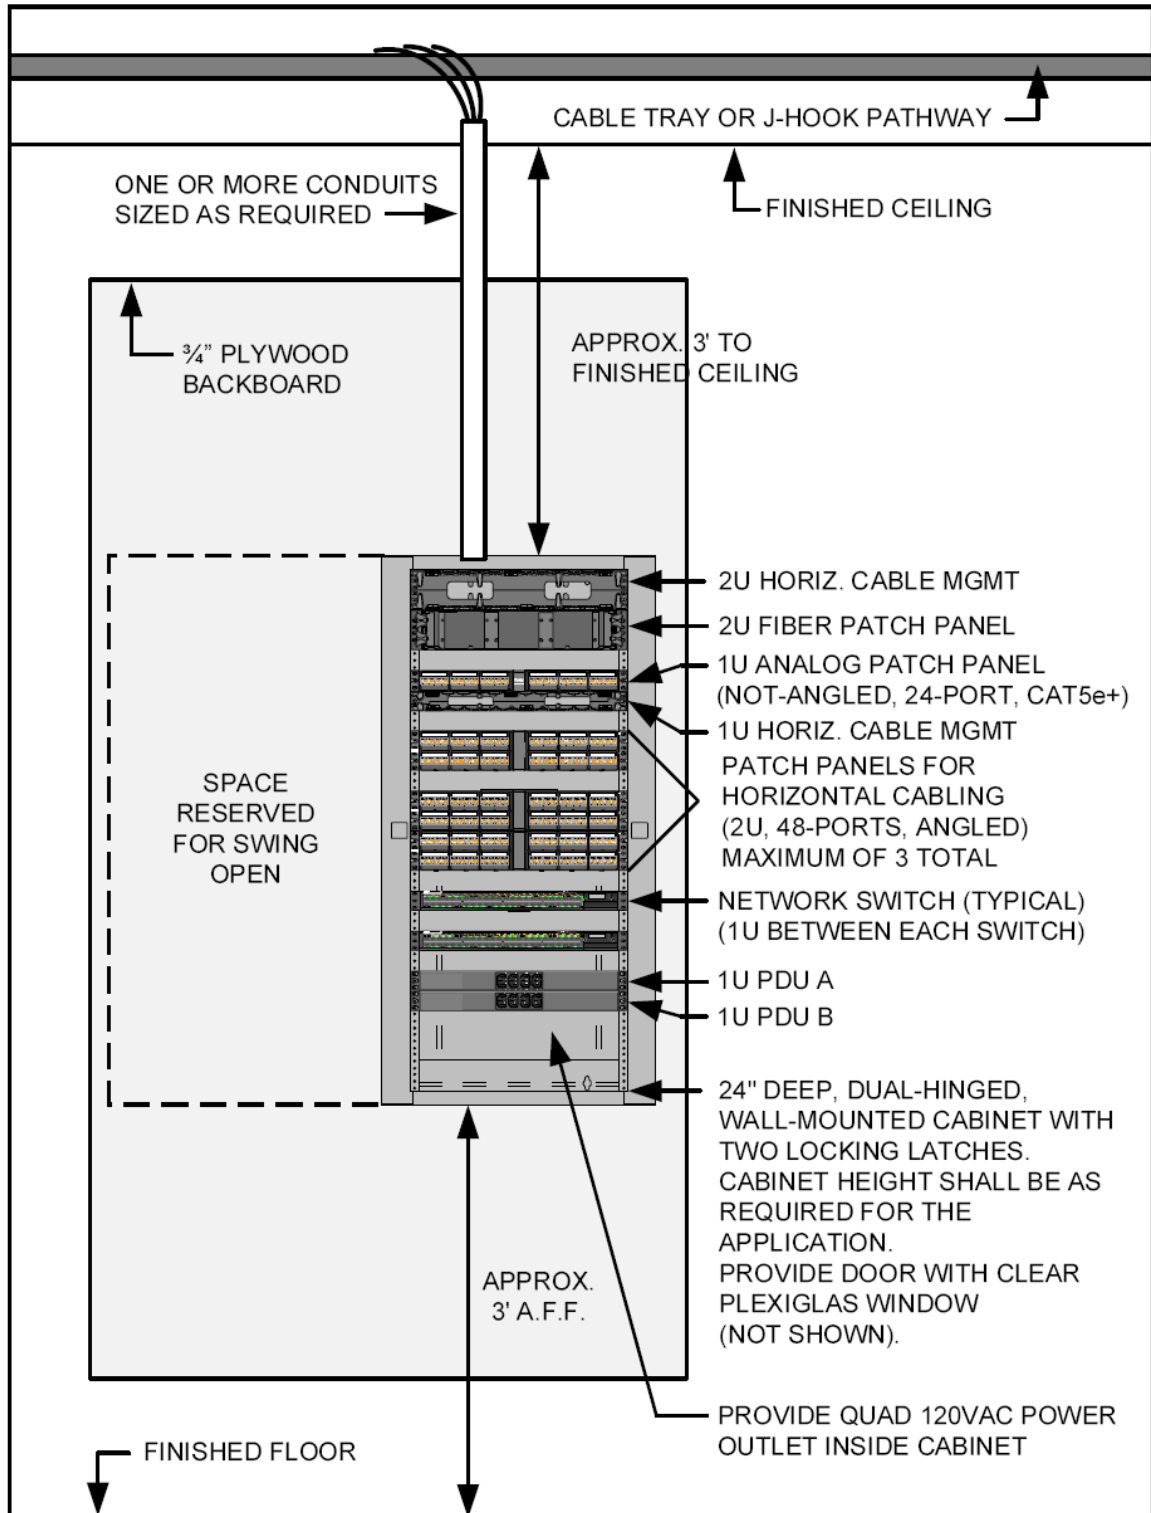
WALL-MOUNTED CABINET ELEVATION
